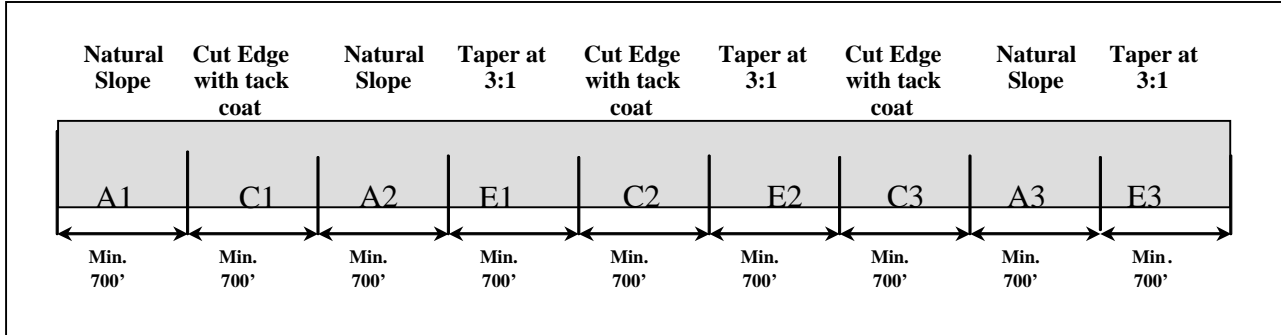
Layout of Test Sections on the US 395 Cold Springs Project.
